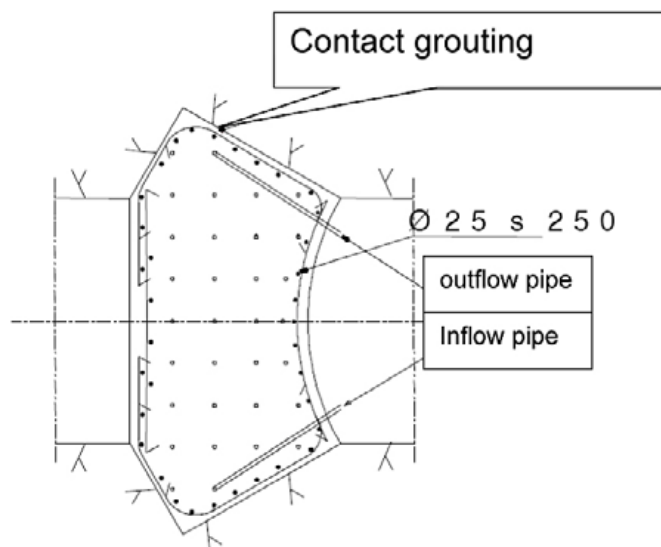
The steel reinforced plug positioned in a notch (see /Nydahl 2008/ for details).
